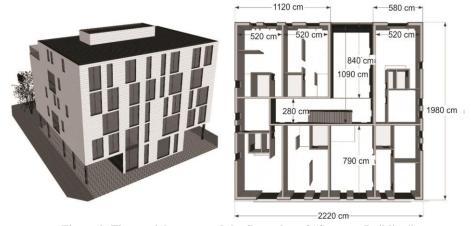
The spatial set-up and the floor plan of "Smarter Building"
